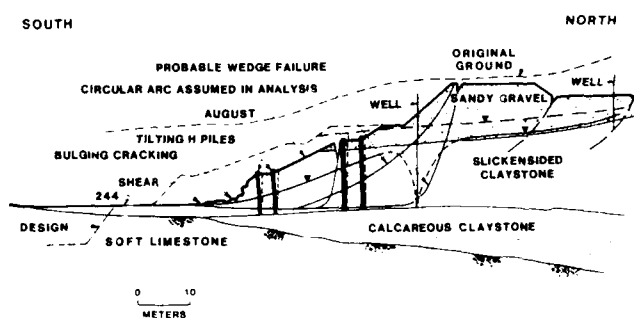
Cross Section of Sliding in the Northeast Corner of the Excavation
